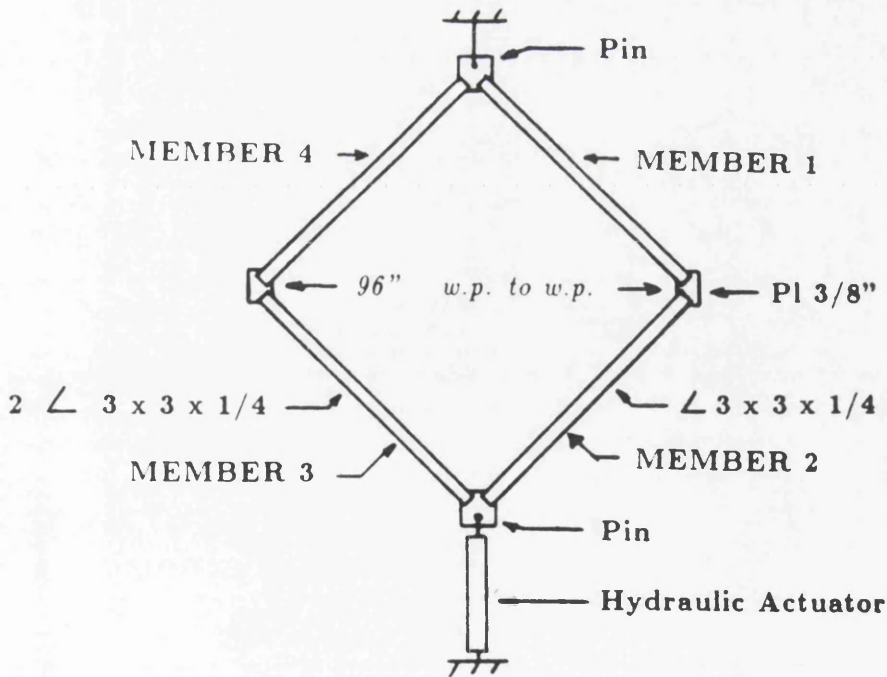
Welded steel frame investigated by Hearn and Testa.
